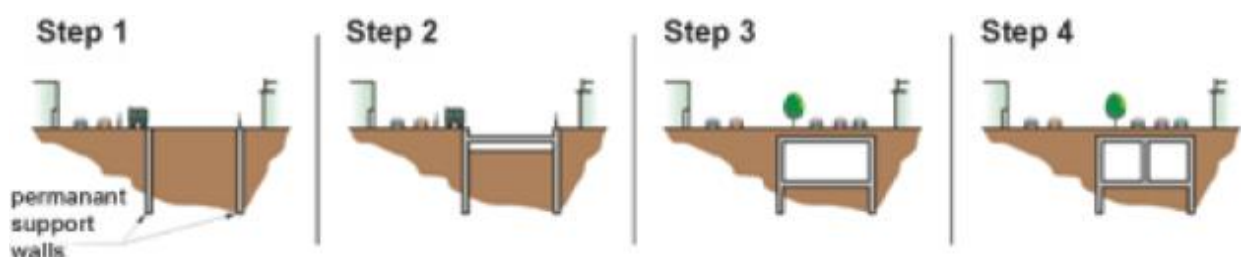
Top-bottom cut-and-cover tunnel construction steps
